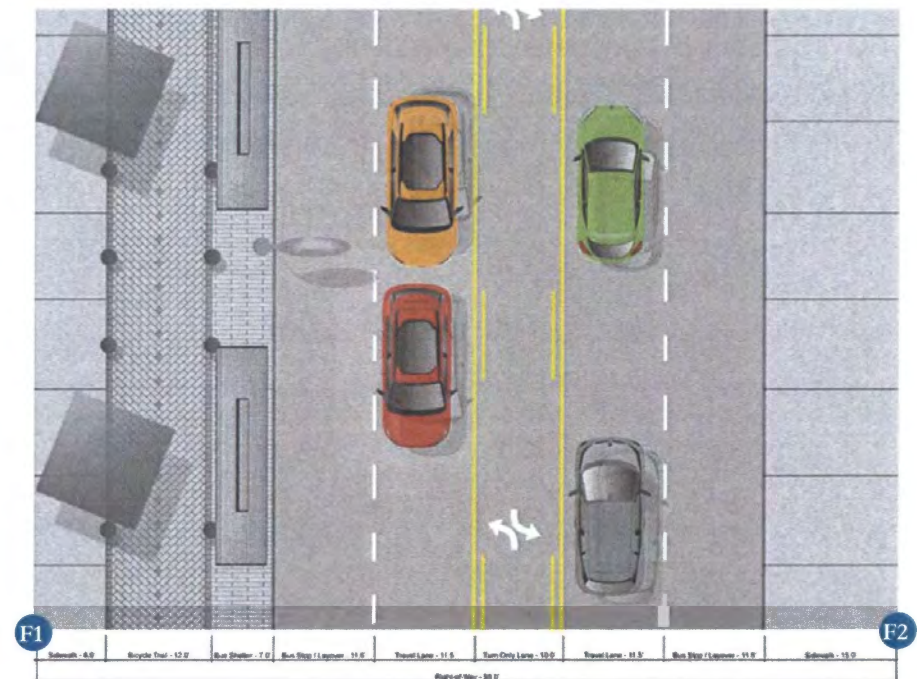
Prospect Avenue between West 3rd and 6th Street Zoomed-In Plan
